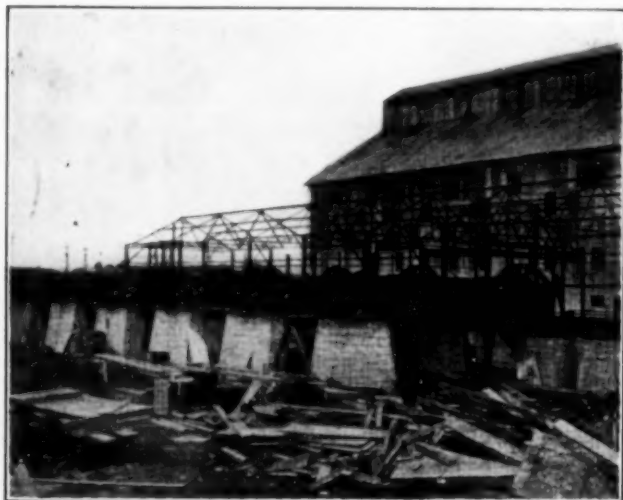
TUBE MILLS AT THE BRAKPAN MILL.
